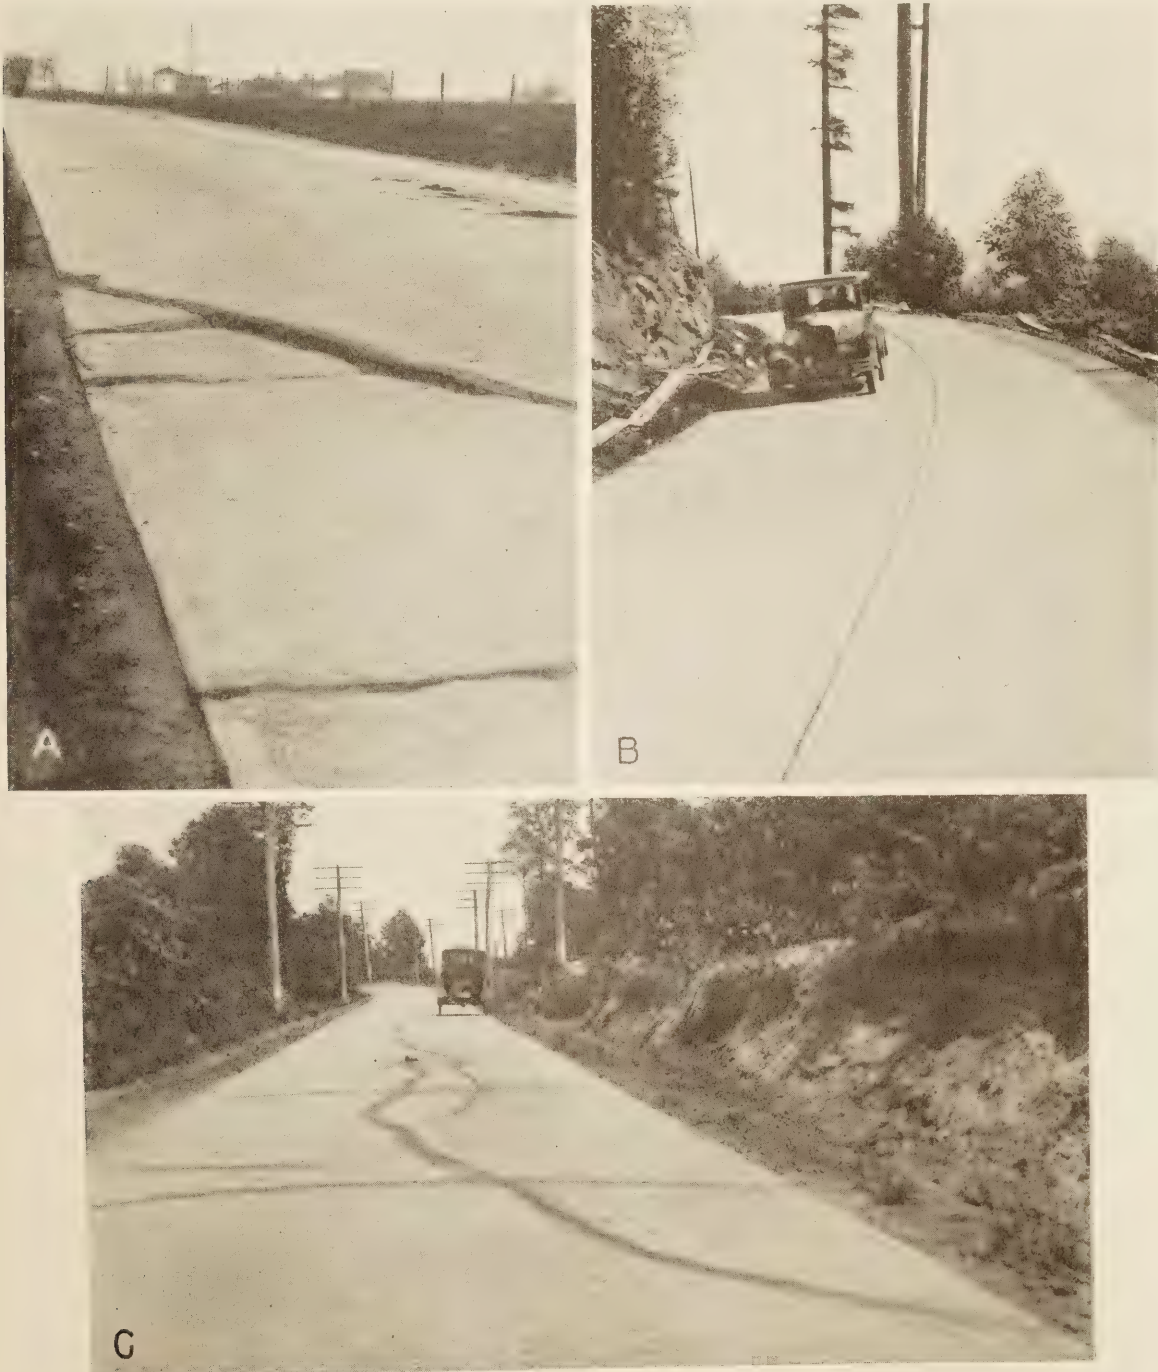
A, CORNER CRACKS OCCURRED ONLY WHERE IRREGULAR TRANSVERSE CRACK INTERSECTS THE SIDE EDGE OF THE PAVEMENT AT AN ACUTE ANGLE; B, NATIONAL PARK HIGHWAY IN WHICH GROOVES AND JOINTS ARE USED TO CONTROL LONGITUDINAL AND TRANSVERSE CRACKING; C, LONGITUDINAL CRACK IN FULL WIDTH SLAB
